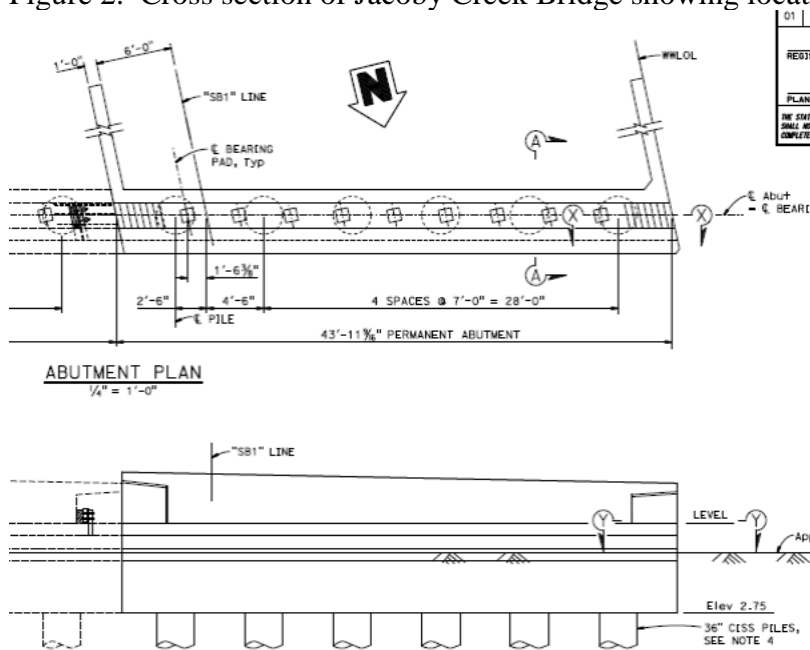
Design plans showing the abutments to Jacoby Ck Bridge.
